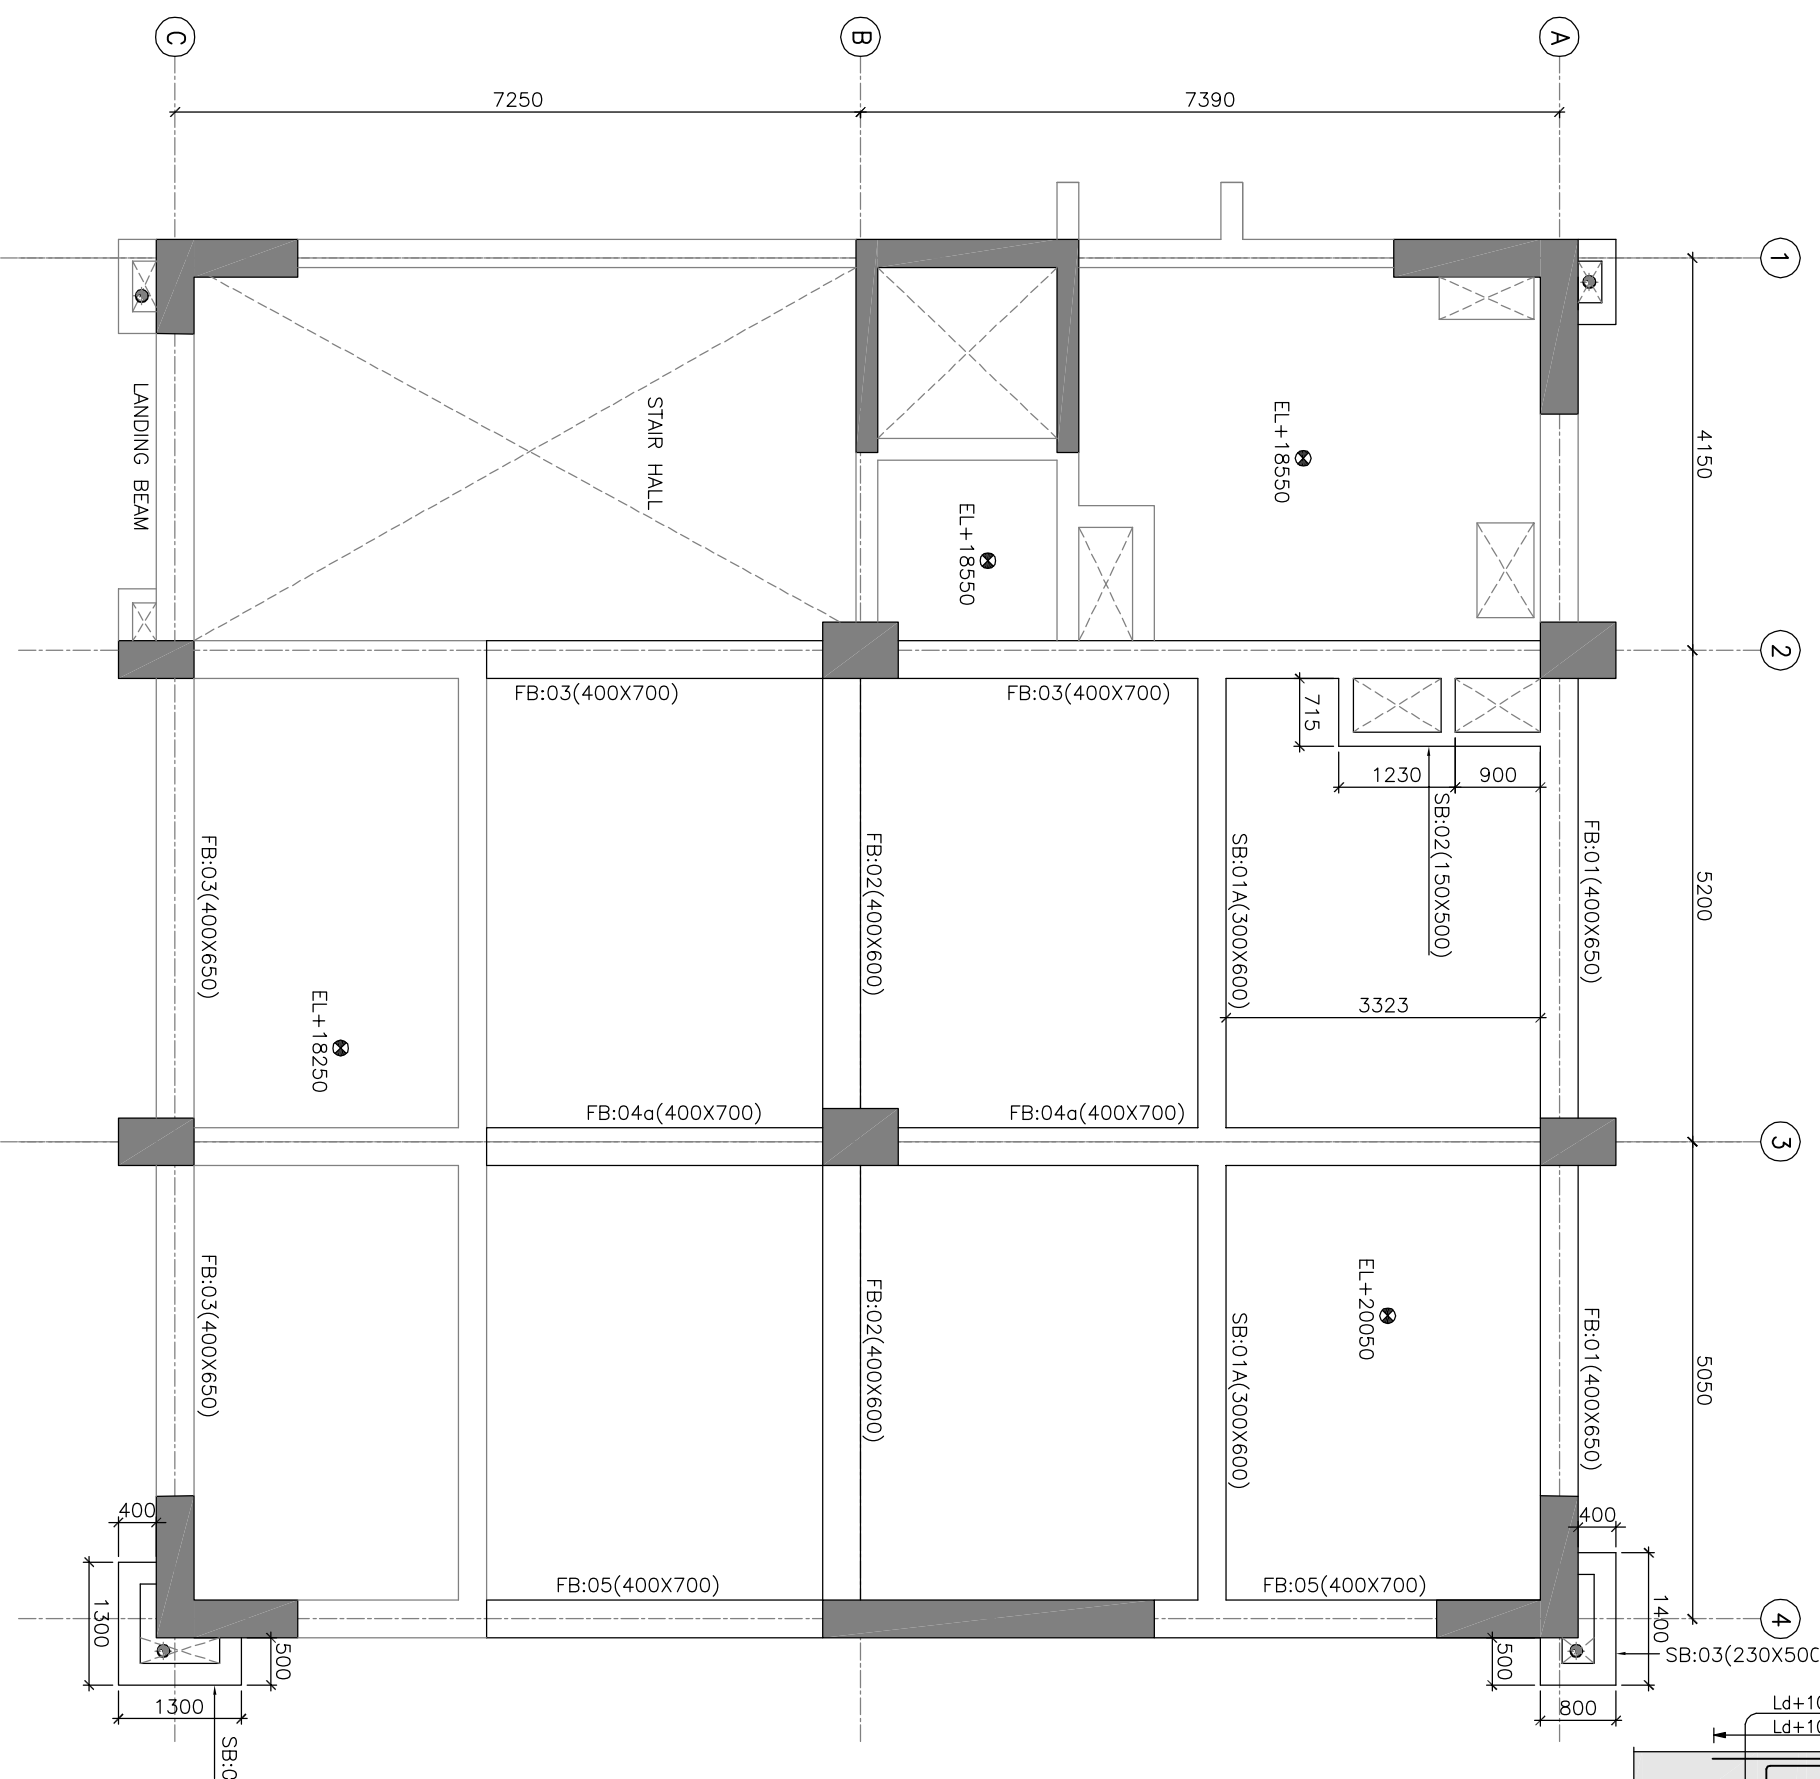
DETAILS OF FOURTH FLOOR BEAM (EL+18550)
